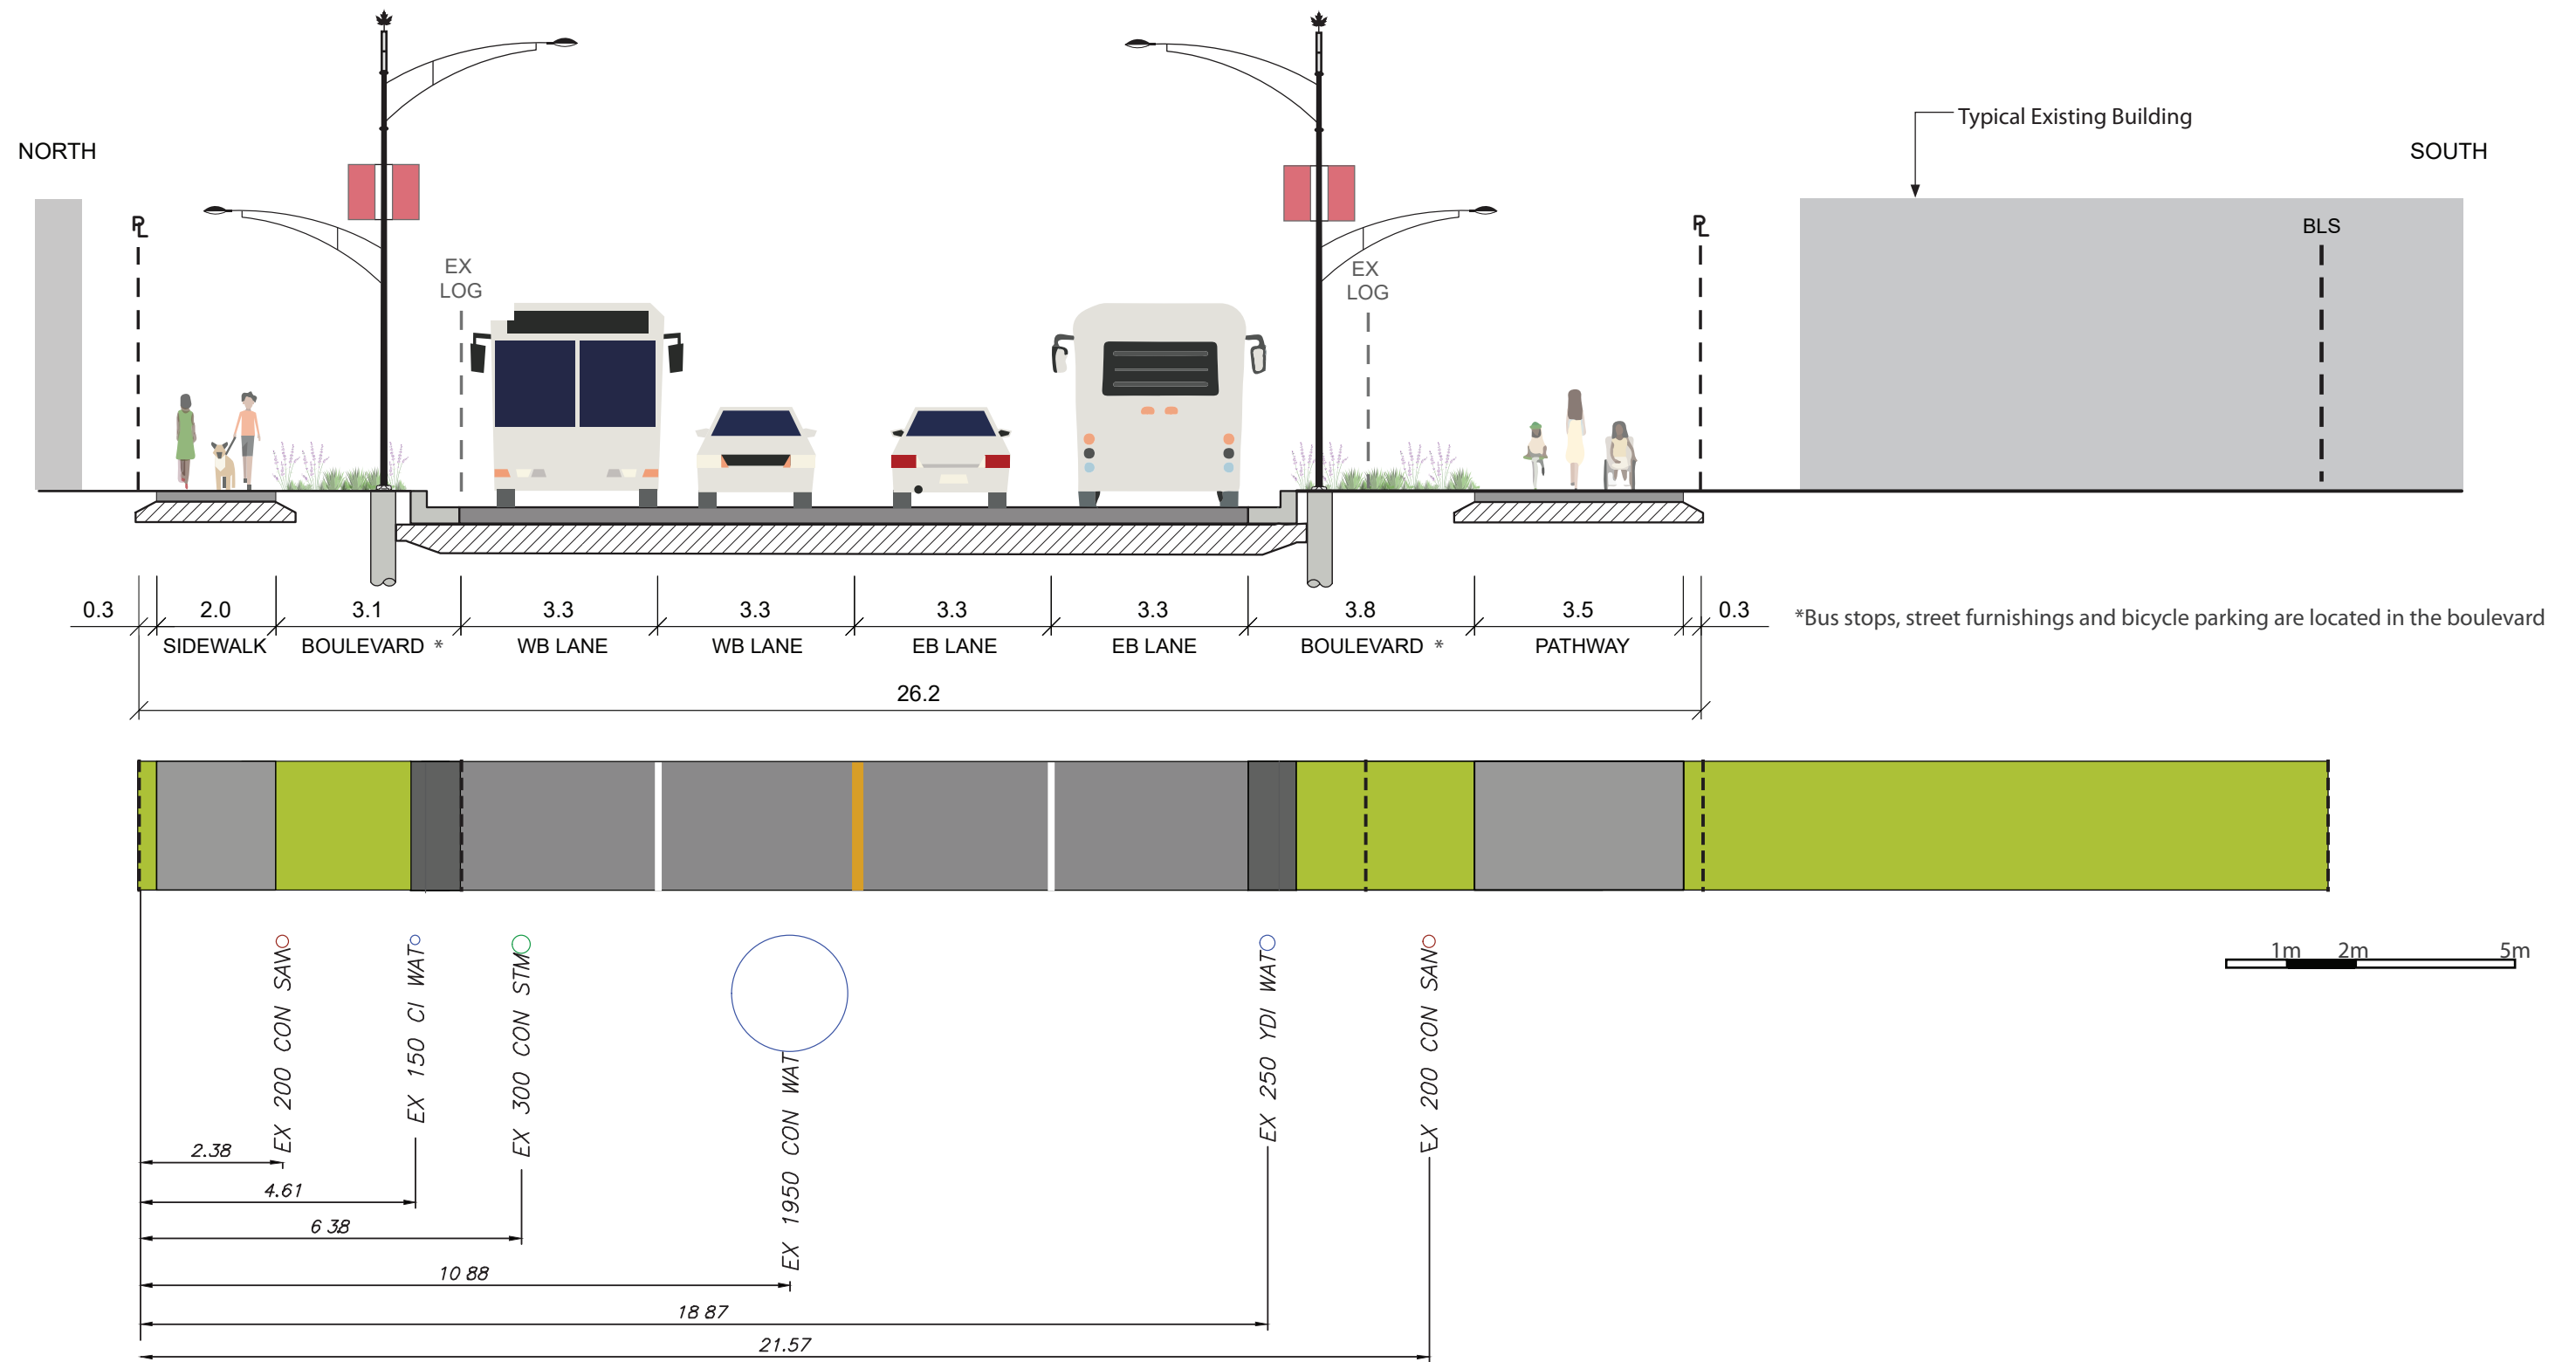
SECTION 'BB' MAIN STREET CROSS SECTION - MEDIUM TERM (EXISTING ROW)
